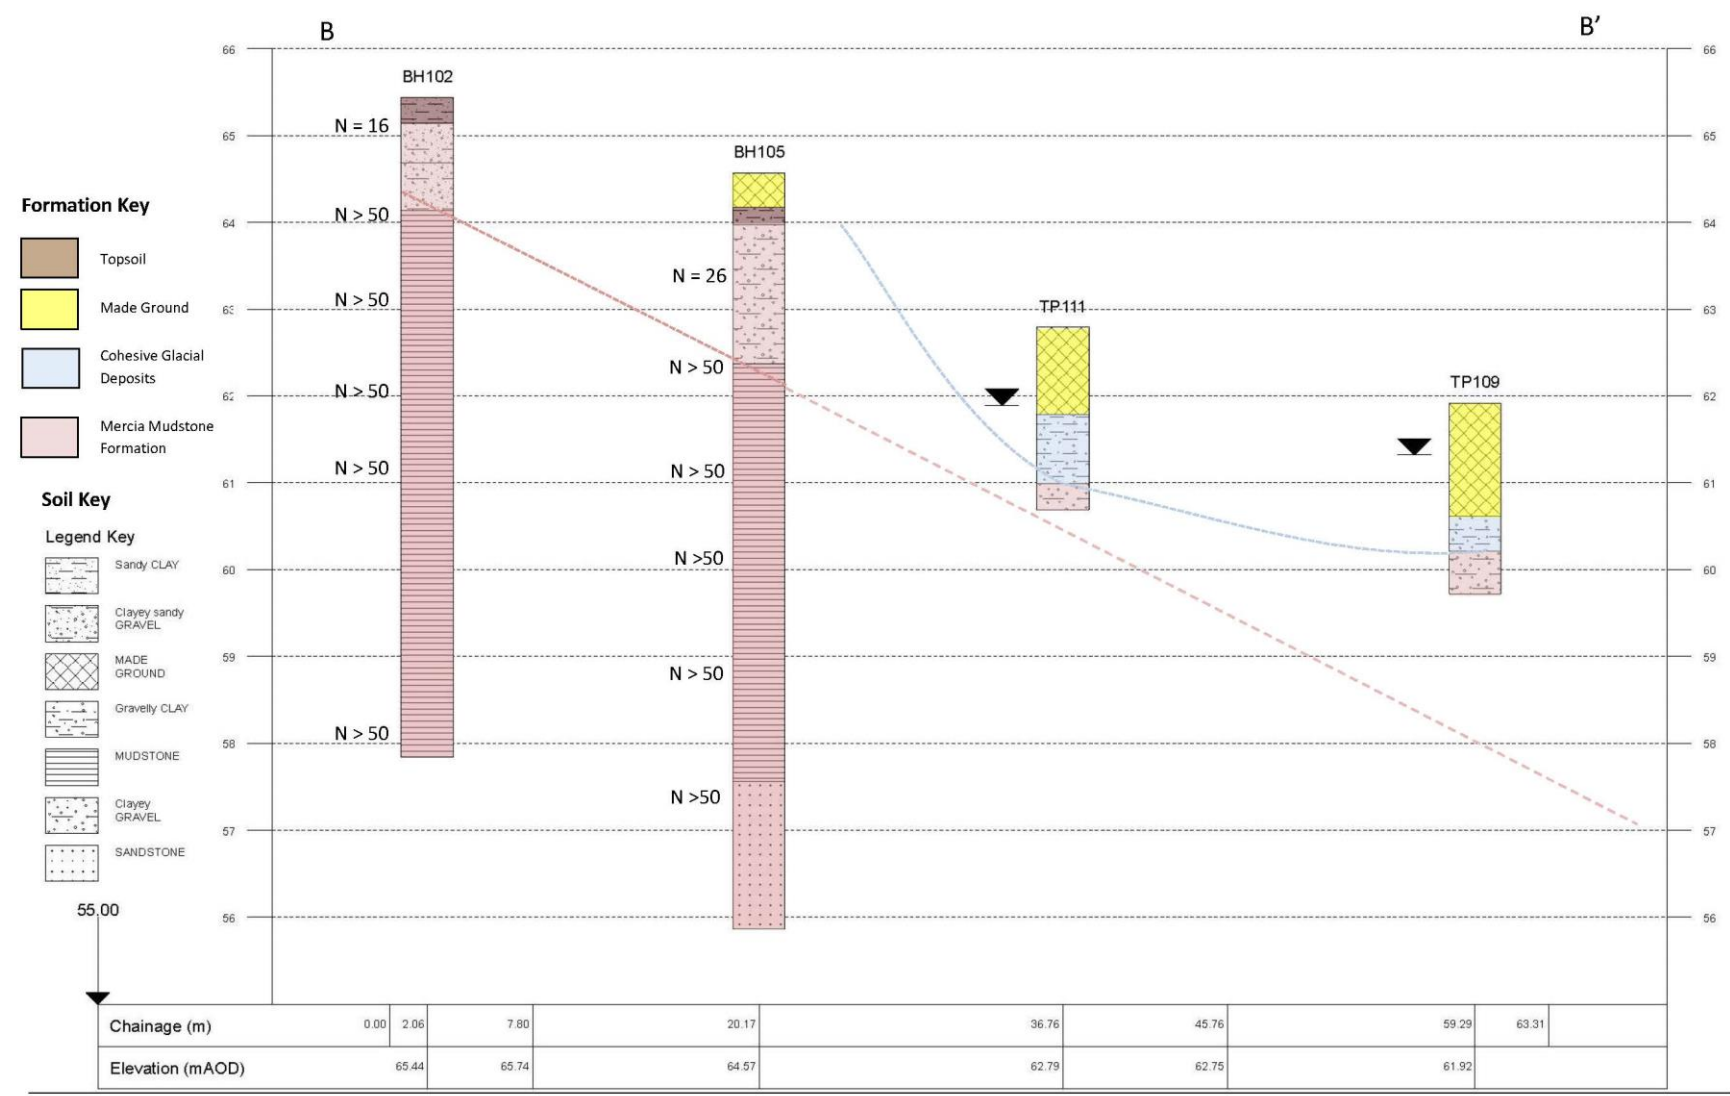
Cross Section. Vertical Scale 1:72, Horizontal Scale 1:342.
